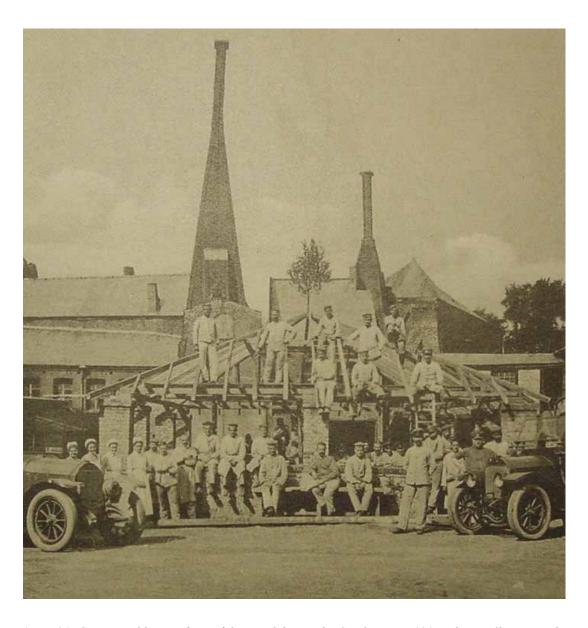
German soldiers in front of the pipe kilns on the Gambier site, 1914. Photo collection author.
